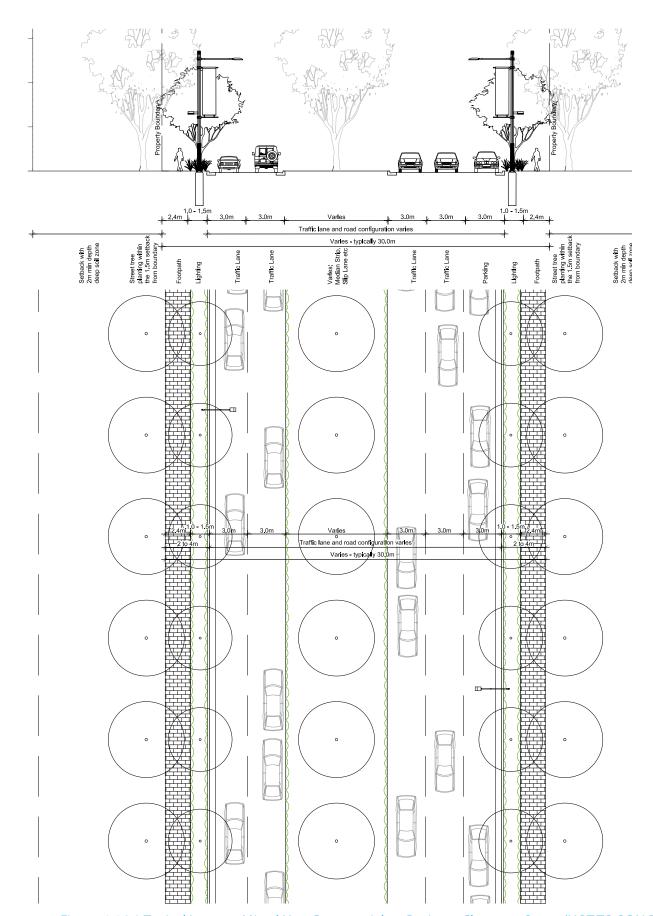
Typical Layout - Mixed Use, Commercial, or Business Character Street (NOT TO SCALE) e.g. Herring Road - Typically 30 metres wide
